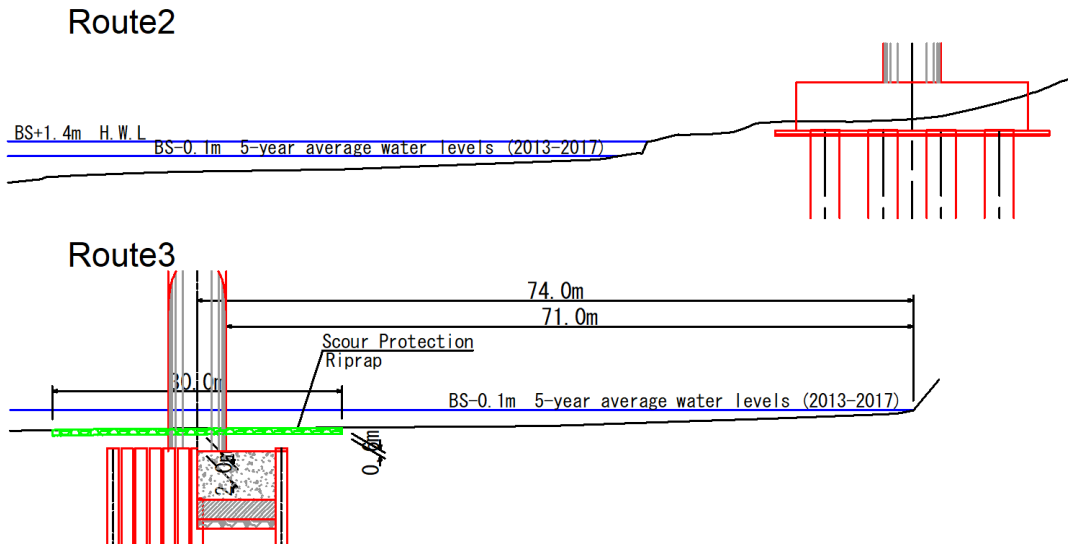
Positional Relationship of Bridge Piers and River Bank
